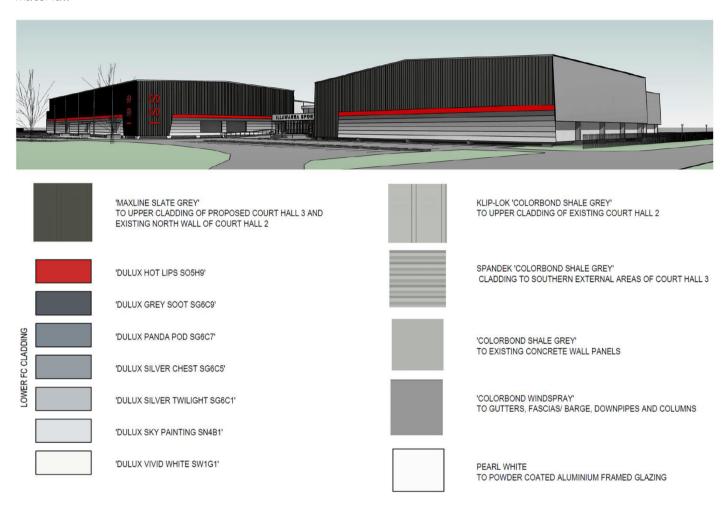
Colourboard of proposed ISS building exterior Source: Facility Design Group, 2020.
